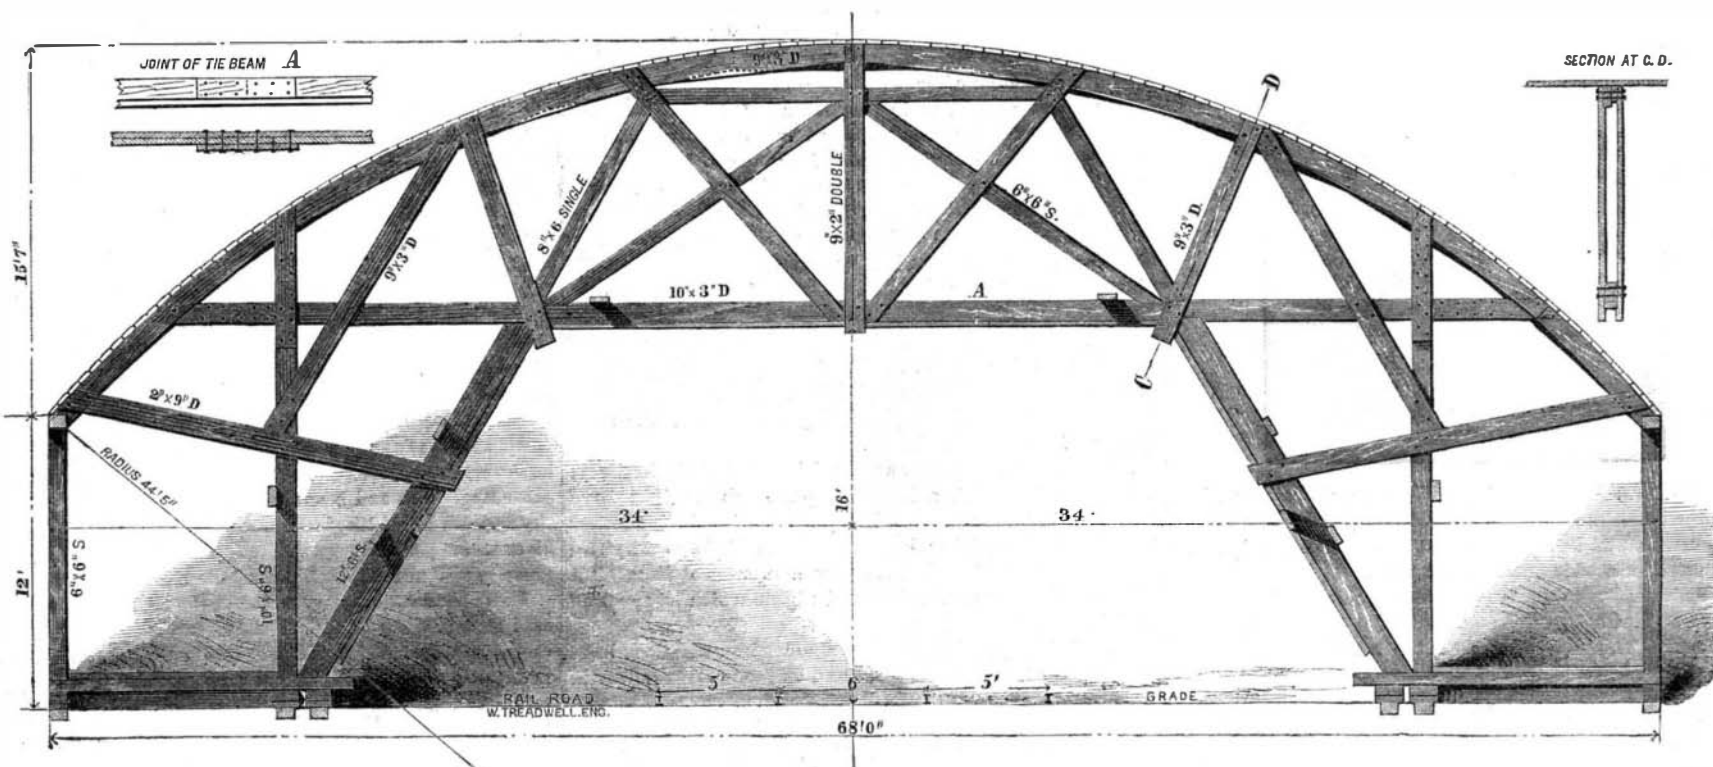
THE UNDERGROUND RAILWAY IN NEW YORK.—CENTERING OF THE GREAT ARCH, FOURTH AVENUE, NEAR 95th STREET.
